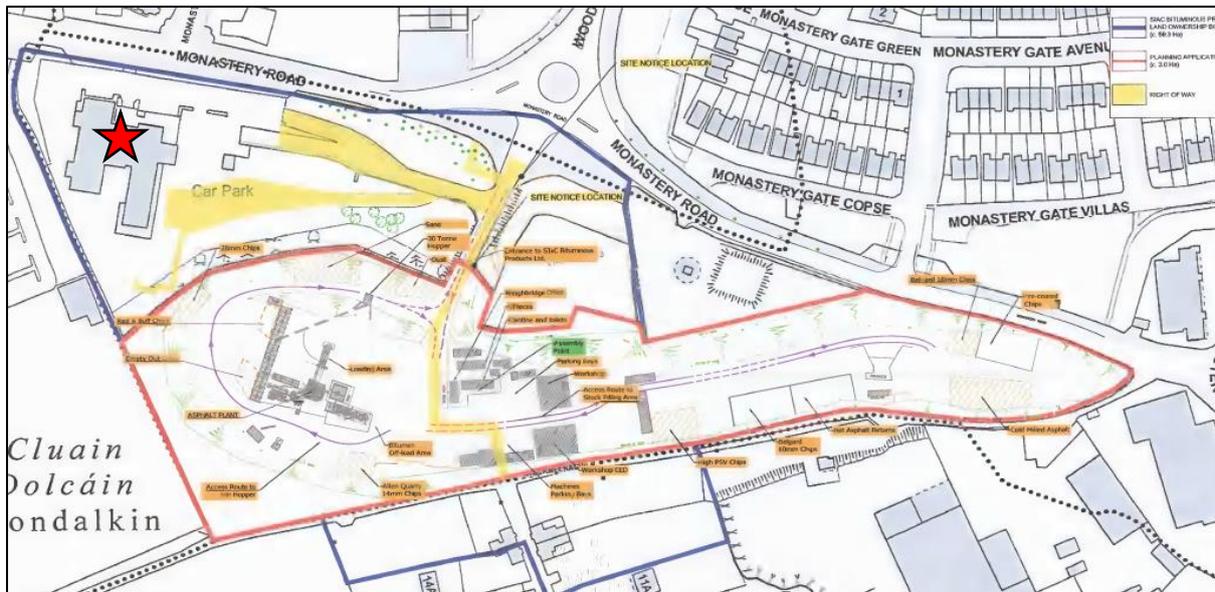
Existing site layout plan submitted under Reg. Ref. SD19A/0063 with the applicable lands outlined in orange in relation to the subject site at Dolcain House (indicated with a red star).
